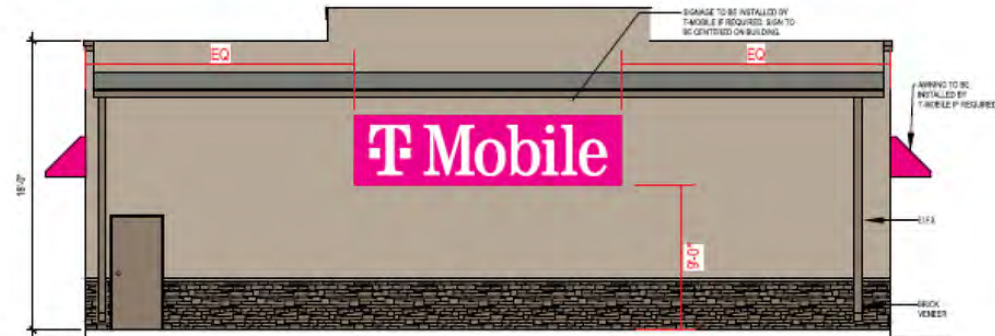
PHOTO SURVEY OF PROPOSED - SOUTH ELEVATION
